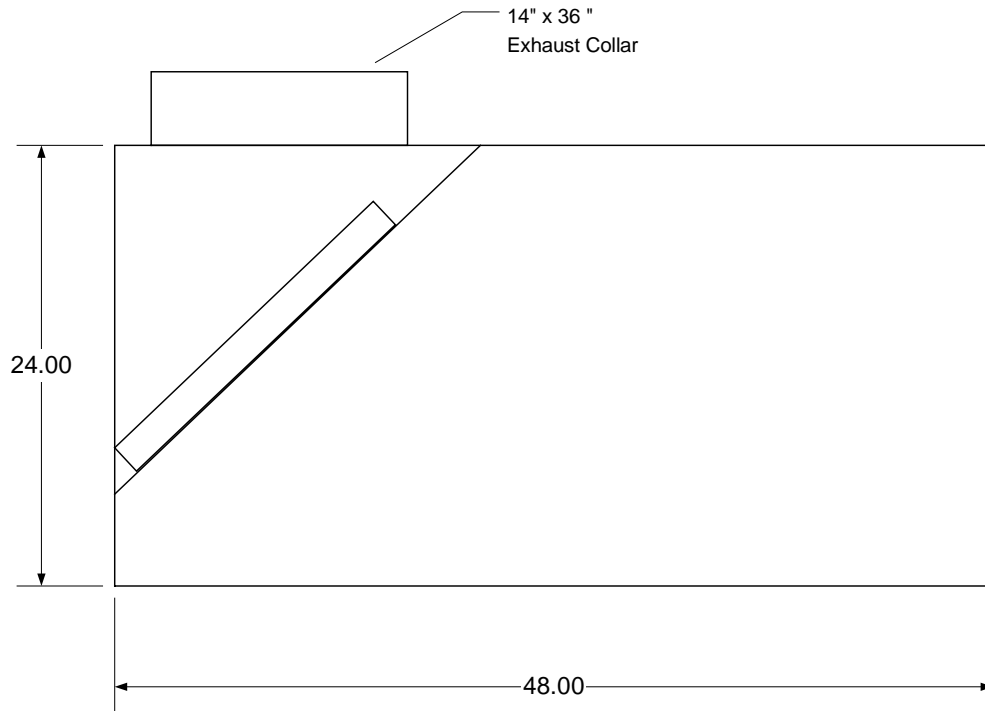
Cross-Section Drawing of the Exhaust Only Canopy Hood
